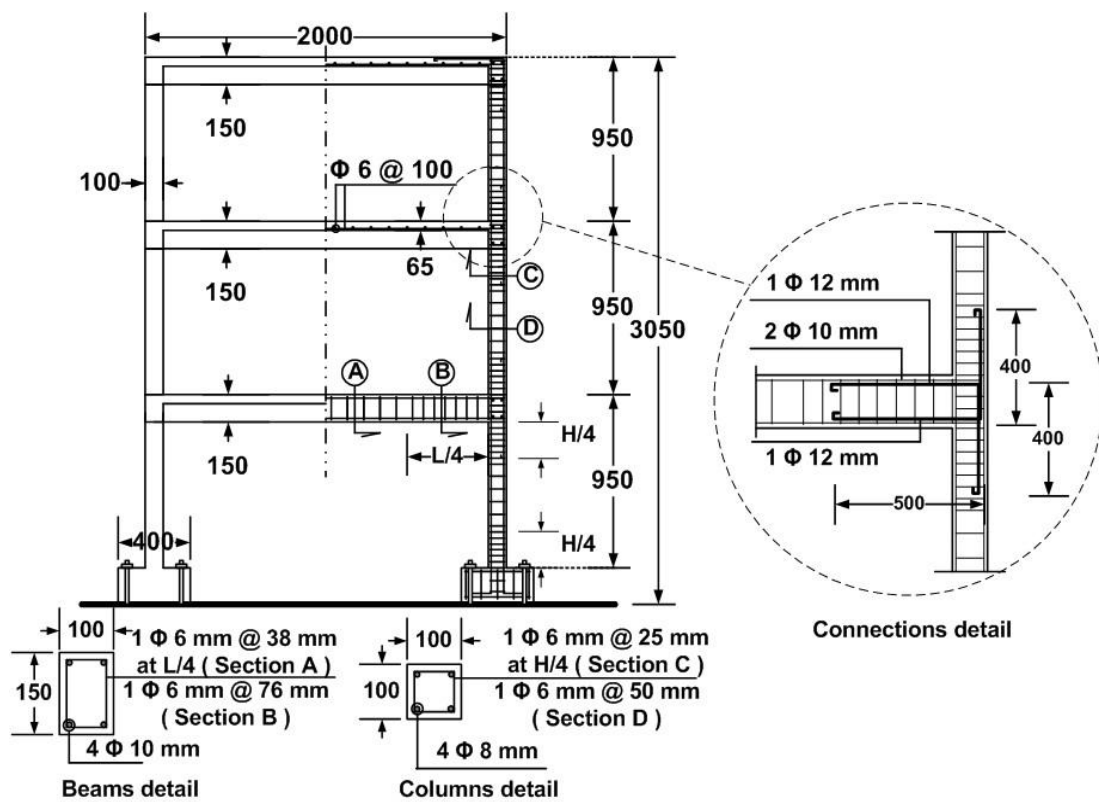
Schematic drawing of Control Frame 3. All dimensions in millimeters.
